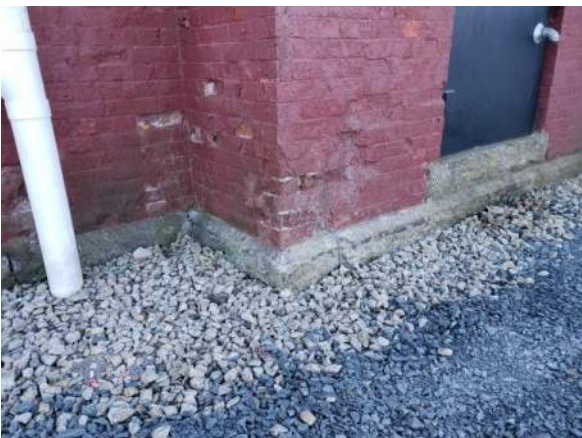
Above grade brick foundation: brick is cracked, broken, and spalled. Typical paint failures include heavy build up plus peeling and cracking.
